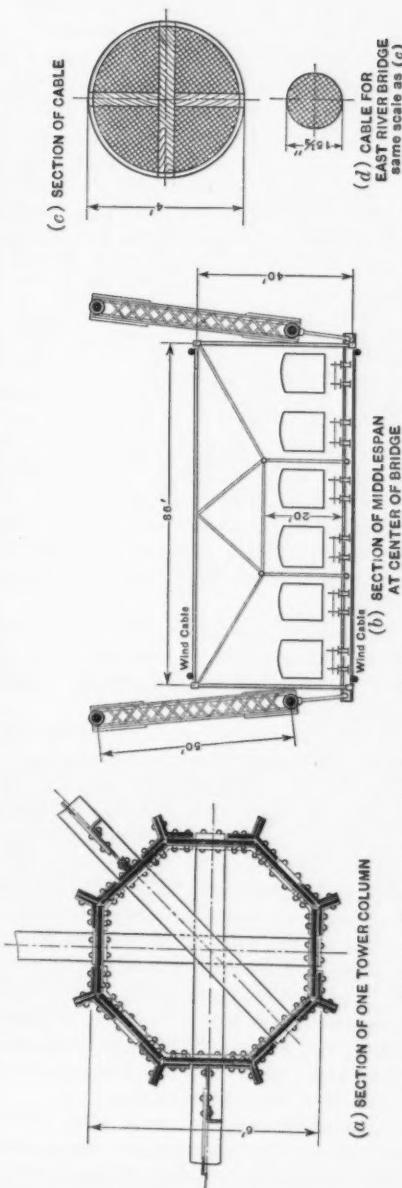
SECTIONS FOR SUSPENSION BRIDGE NEAR 23D STREET, MANHATTAN, DESIGNED IN 1899.
